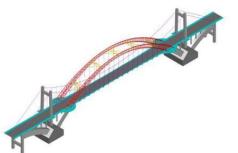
3D Design Drawing of 800m Concrete Filled Steel Tube Arch Bridge
